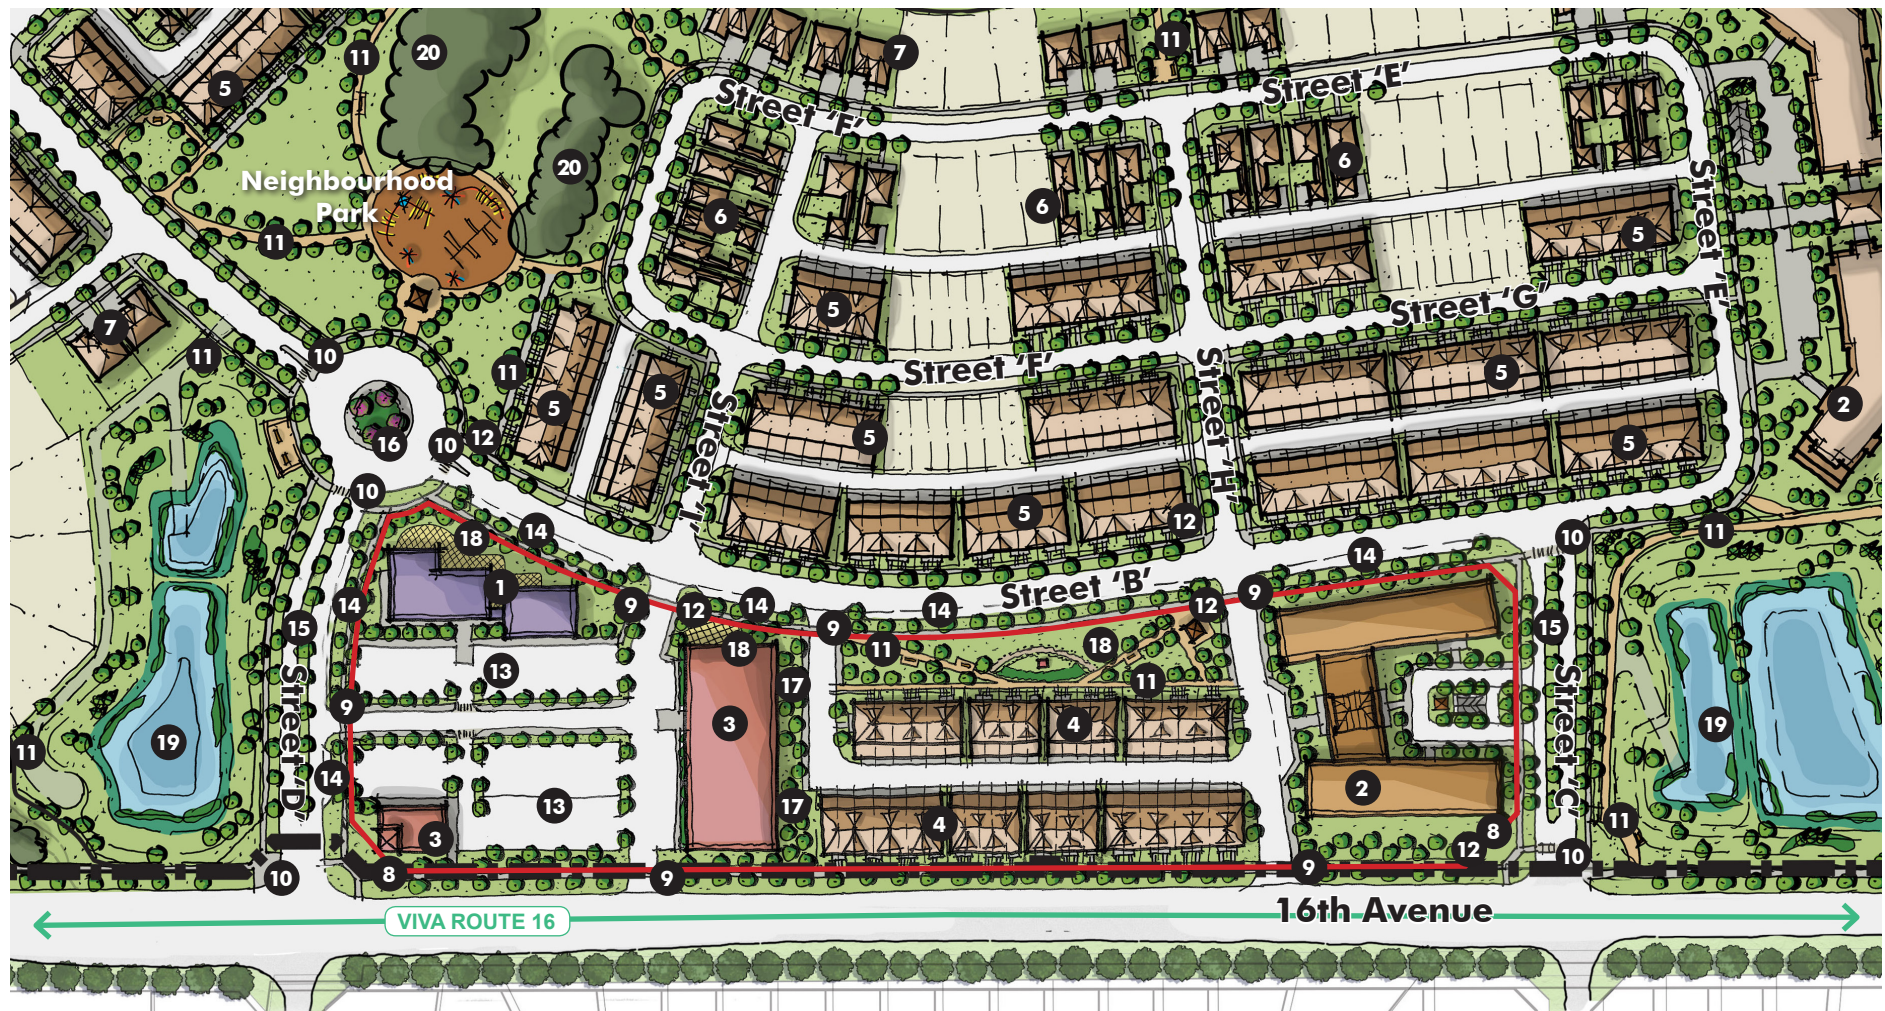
Demonstration Plan of the Mixed Use Block (West Neighbourhood)
